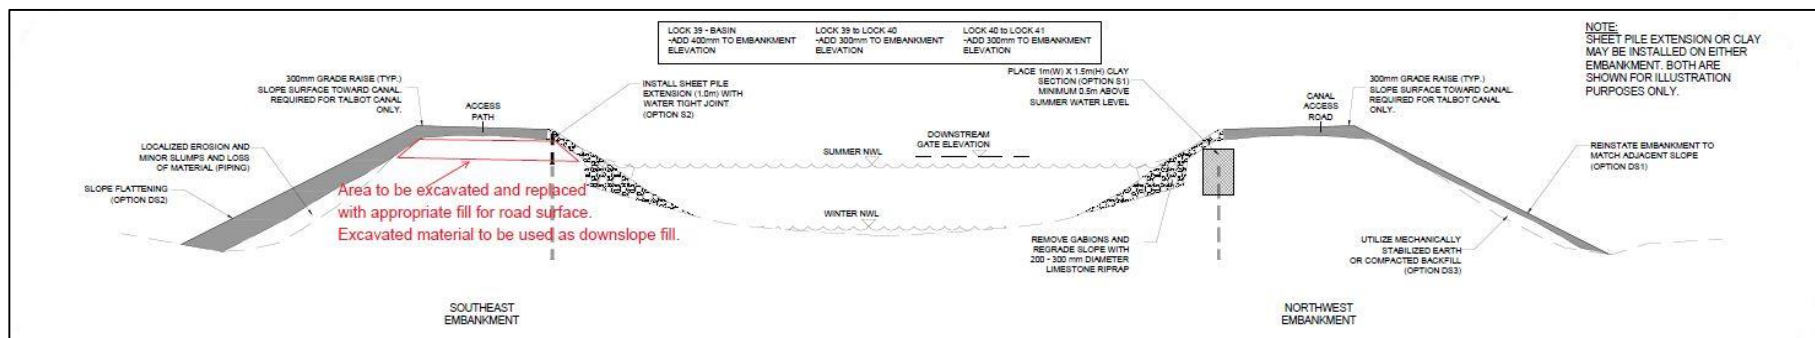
Drawing depicting proposed works/changes to canal walls and extent of excavation in road repair areas
